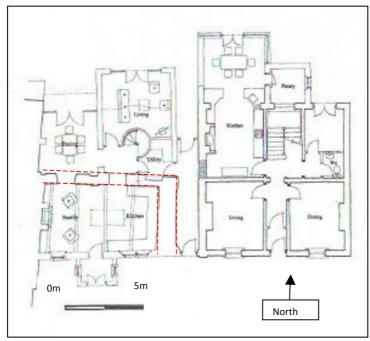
Ground plan of proposed development adjacent to Midcroft House
